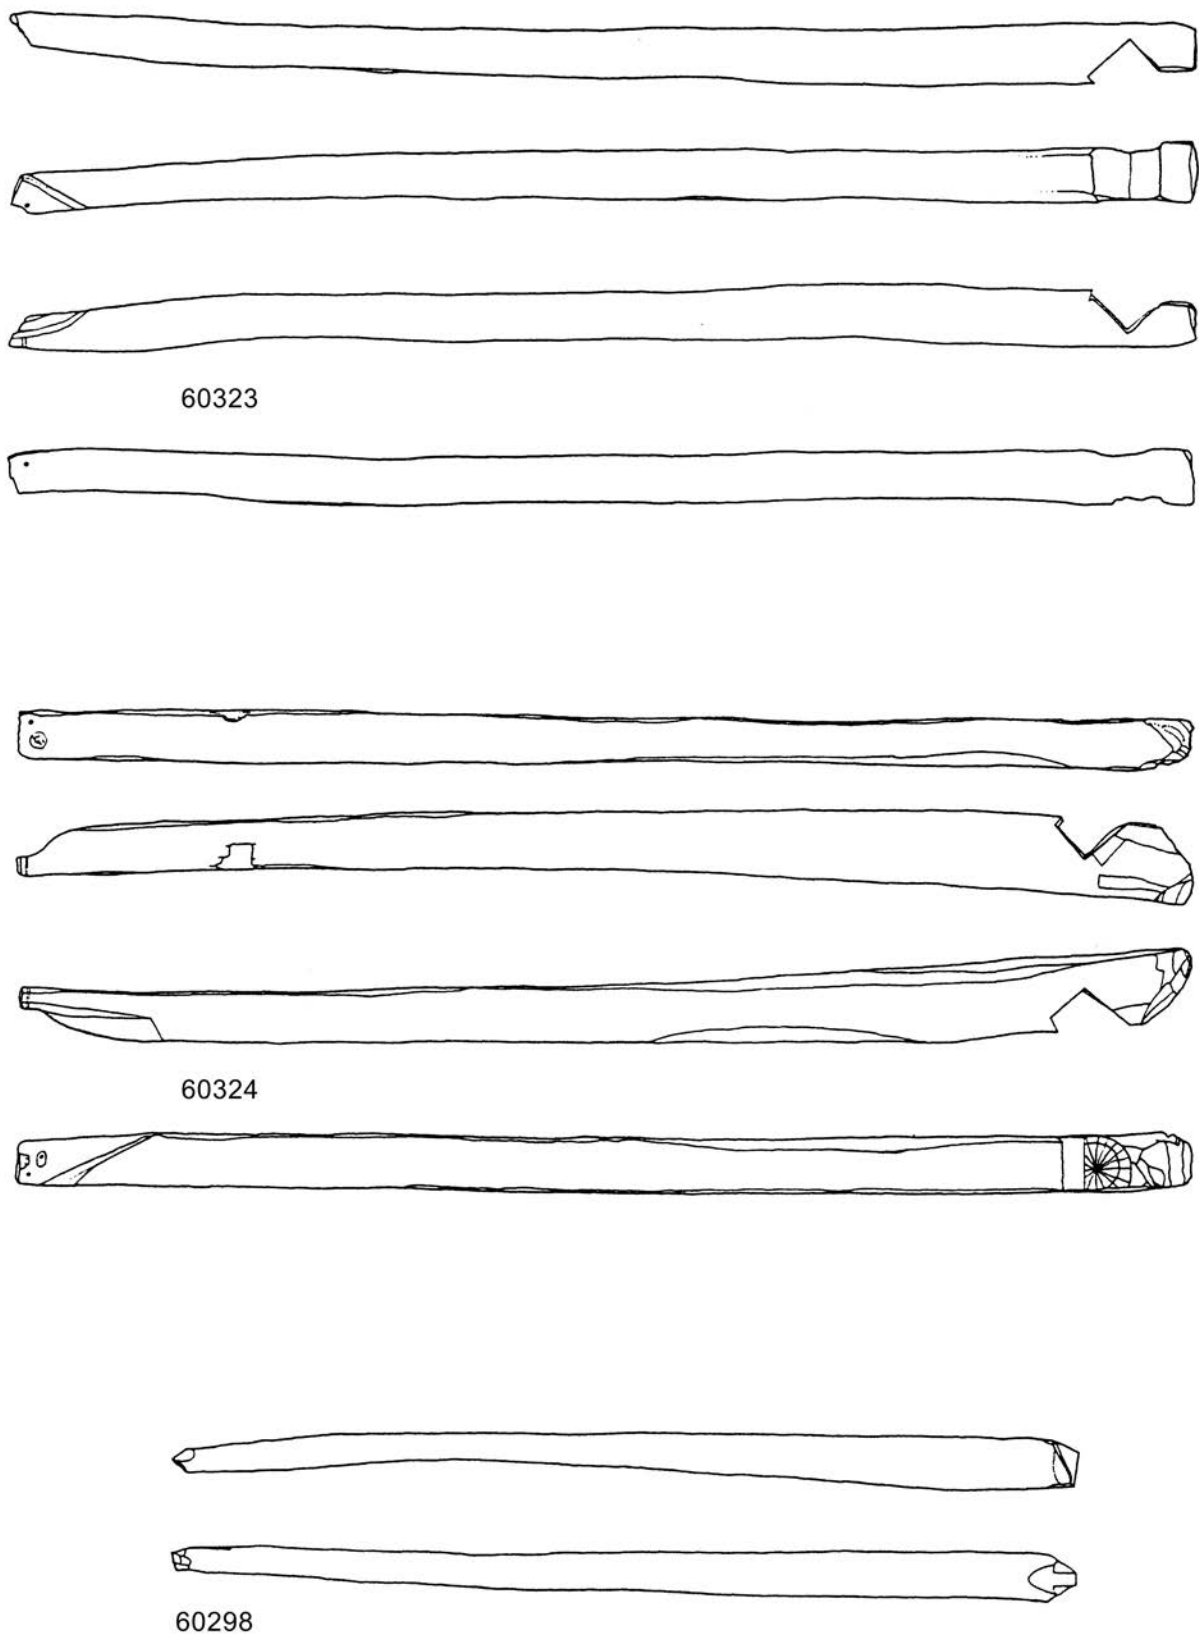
Area 6: jack rafters (60323/4) and common rafter (60298) re-used in box revetment 60016. Scale 1:20
